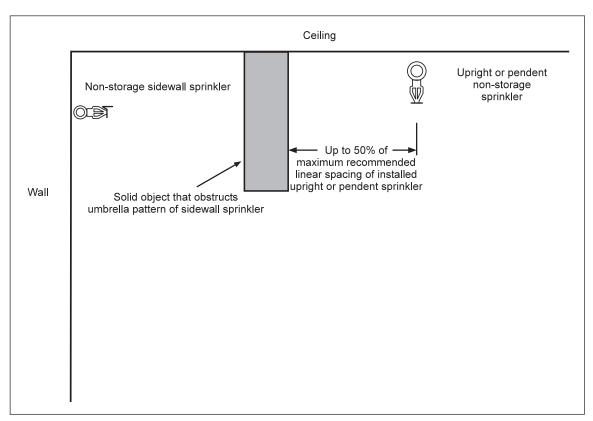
Additional sprinklers installed to account for obstructed umbrella discharge pattern away from the wall caused by solid objects at ceiling level
